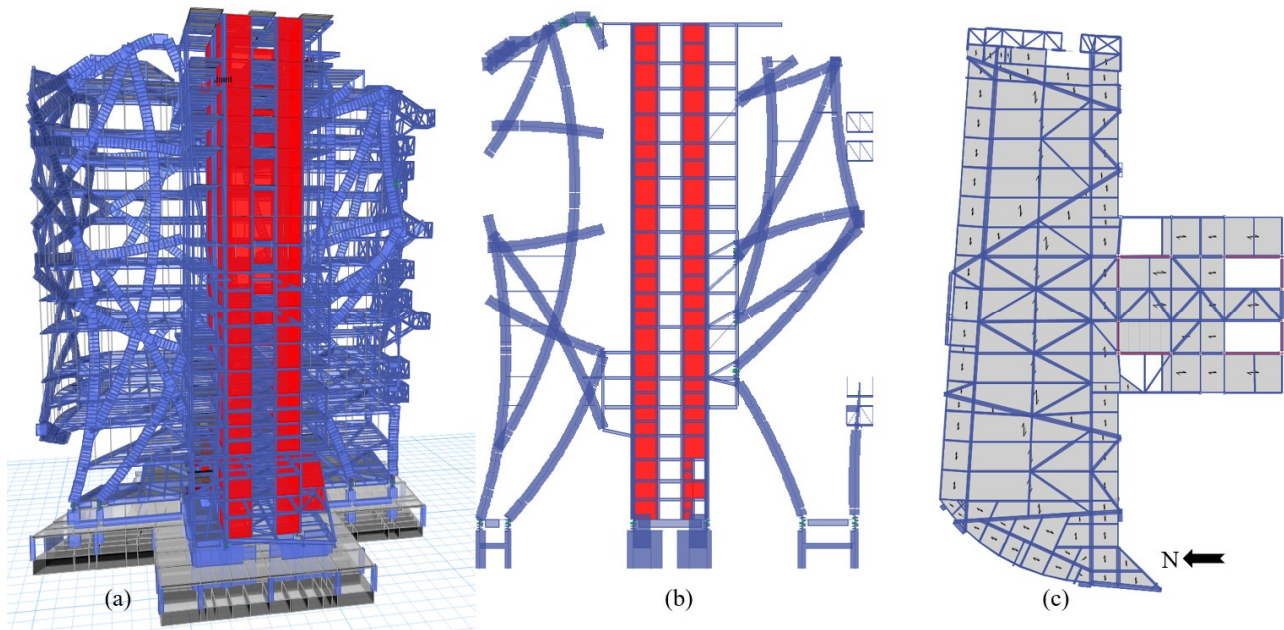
3D Isometric (a), elevation (b) and typical floor plan view (c) of the Tower analysis model in ETABS
